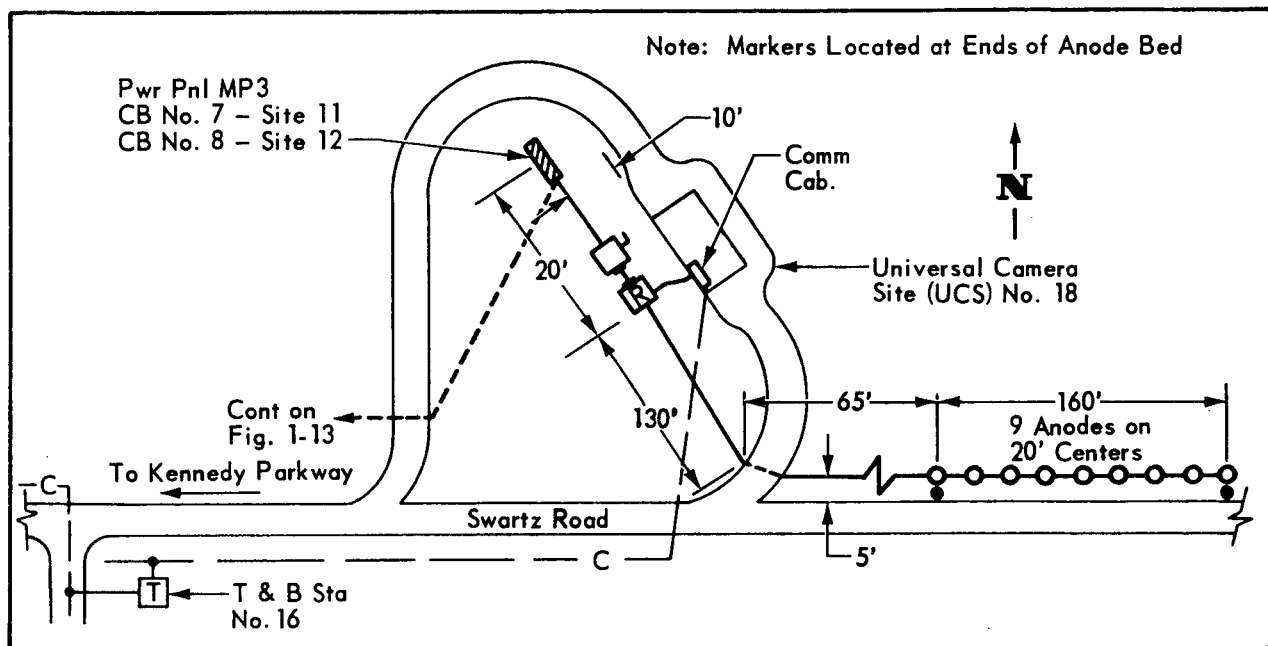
Site No. 11 and Test and Bond Station No. 16 Equipment Locator
